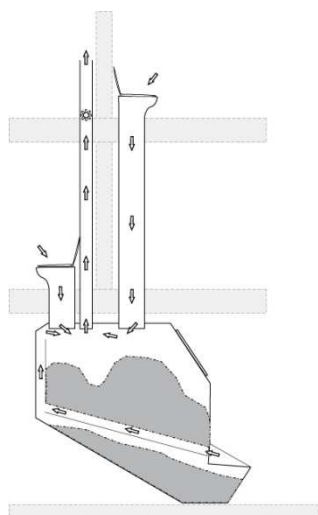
Cross section of a single-vault composting toilet, showing the ventilation system (source: Berger and Lorenz-Ladener, 2008).
